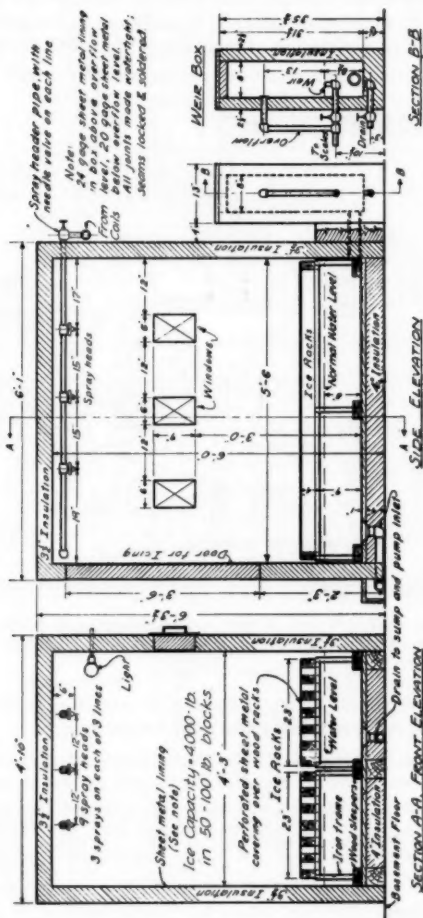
DETAILS OF ICE TANK AND WEIR BOX, SHOWING ARRANGEMENT OF ICE RACKS, WATER SPRAY PIPES AND PIPING
